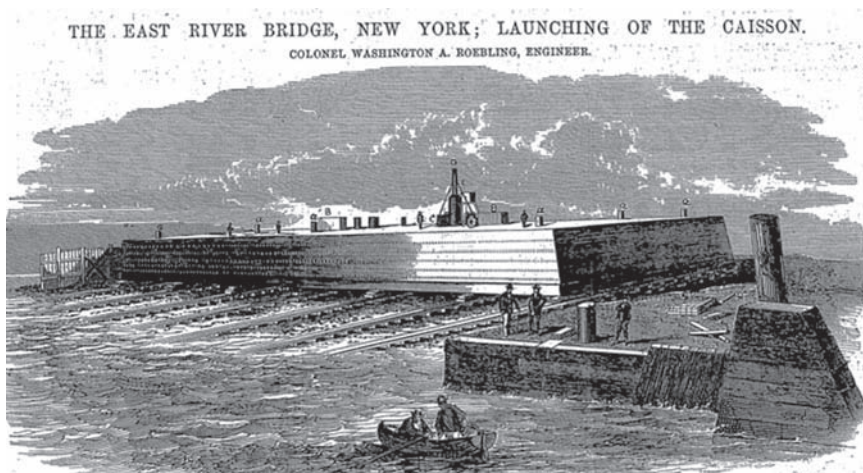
The Brooklyn caisson before being launched (Engineering 1870).
